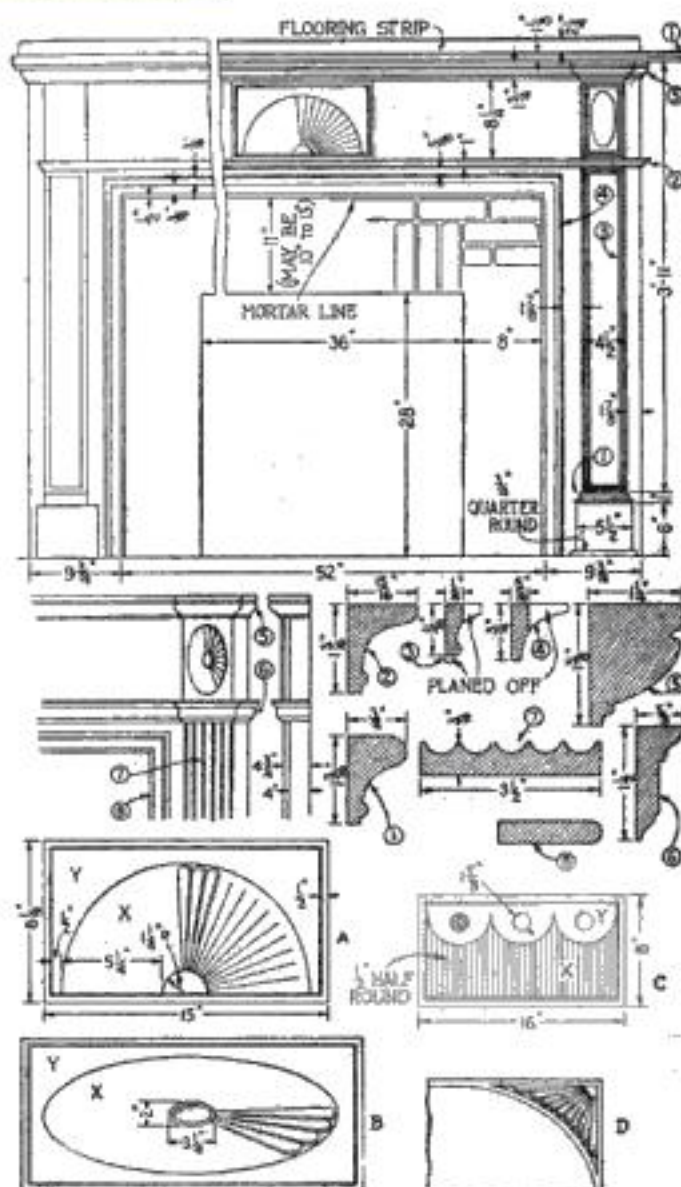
Working drawings of the mantel shown in Fig. 1, page 81; a key to Fig. 3; other designs
